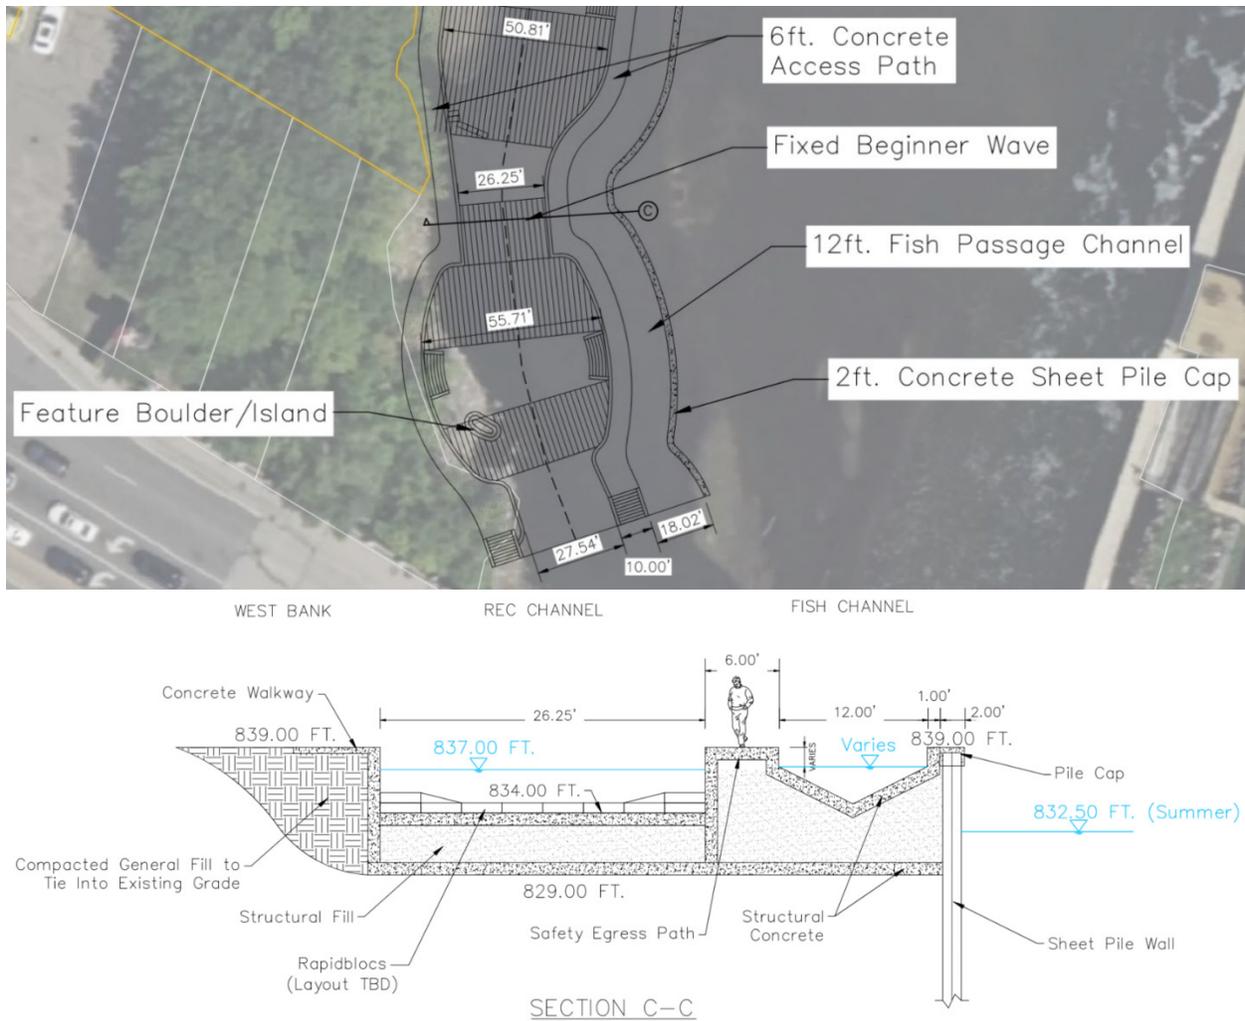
Lower channel plan and conceptual Section C-C (wave structure)
